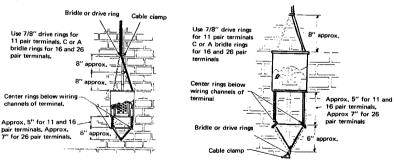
Building Mounted Cable Terminal (Top Entrance)
